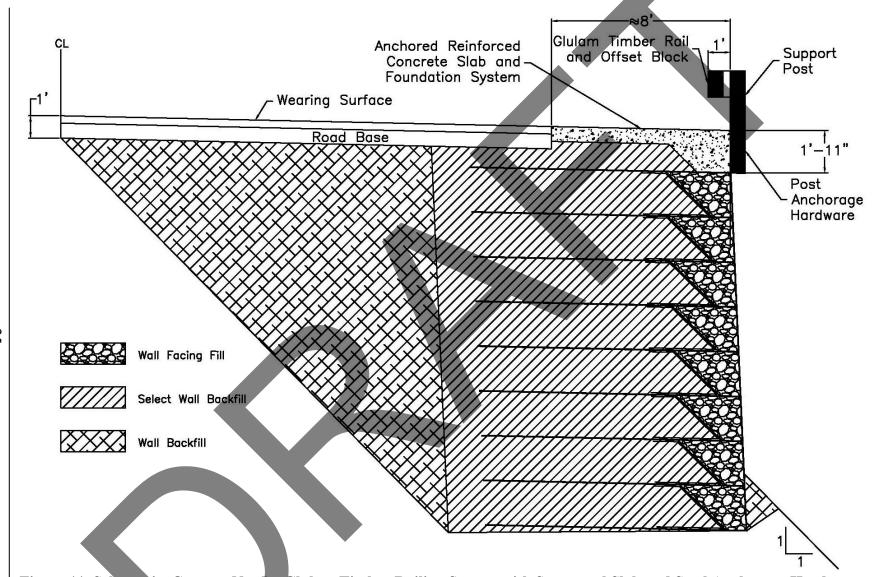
Schematic. Concept No. 5 – Glulam Timber Railing System with Structural Slab and Steel Anchorage Hardware.
